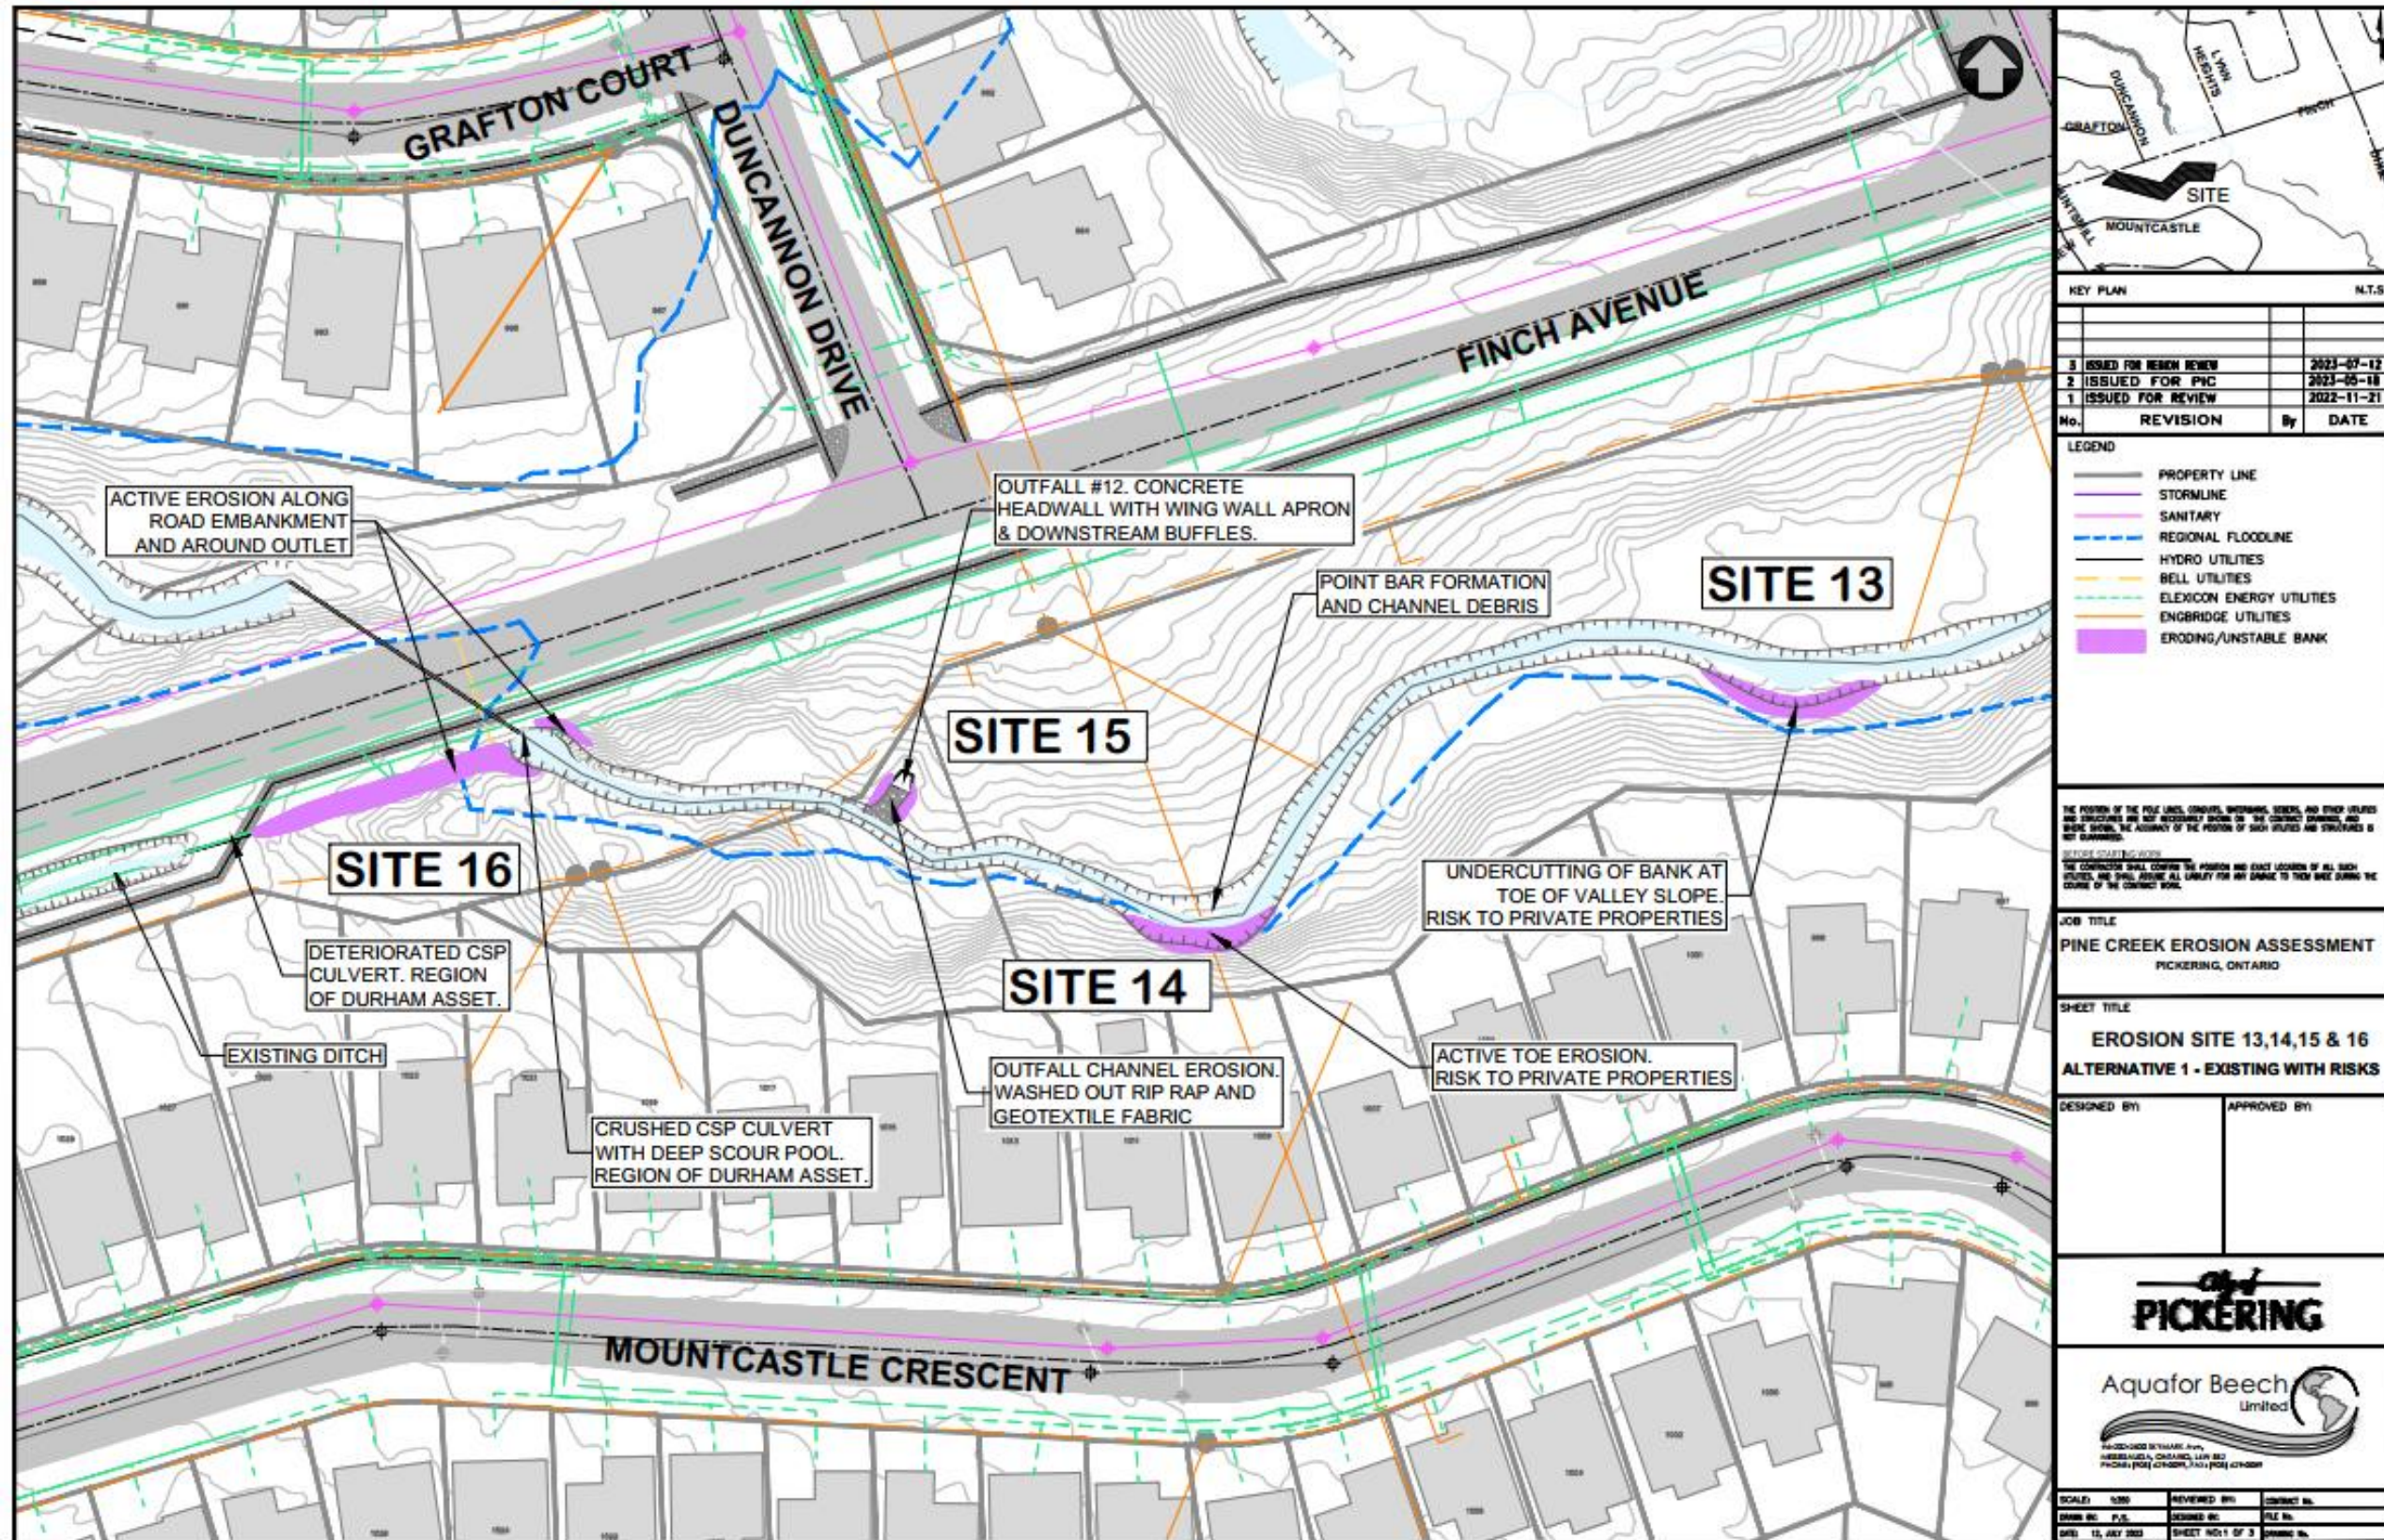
Erosion Site #13-16: Existing Site Conditions
